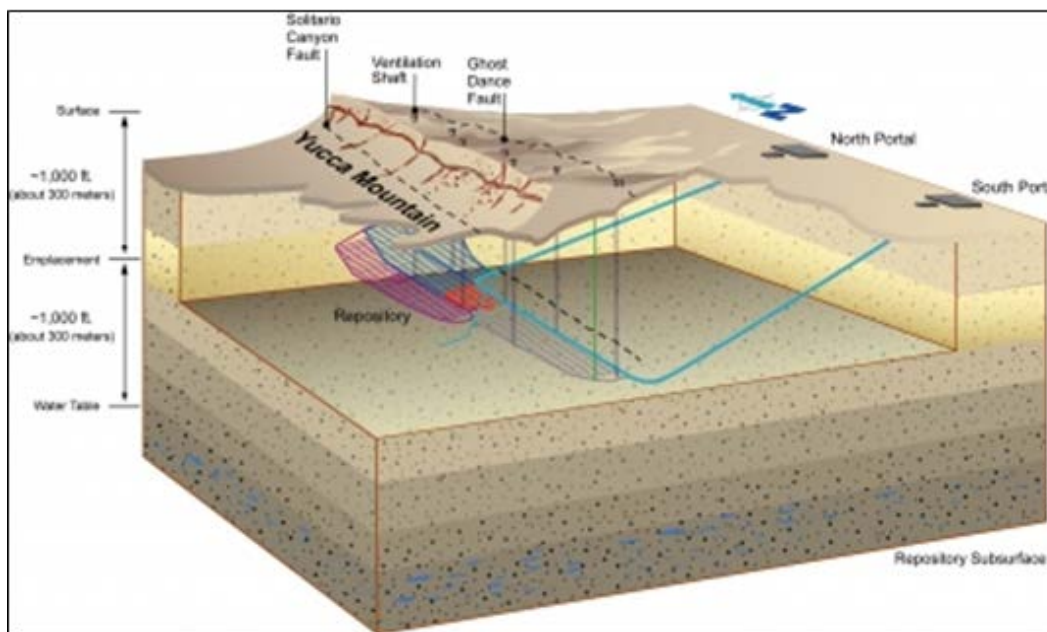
Cutaway image of Yucca Mountain, its sequence of effusive-volcanic-rock layers, and the planned network of repository tunnels. The existing U-shaped access/exit tunnels and their adjoining test rooms/niches were closed in 2009. (Source: U.S. Department of Energy, 2010.)
